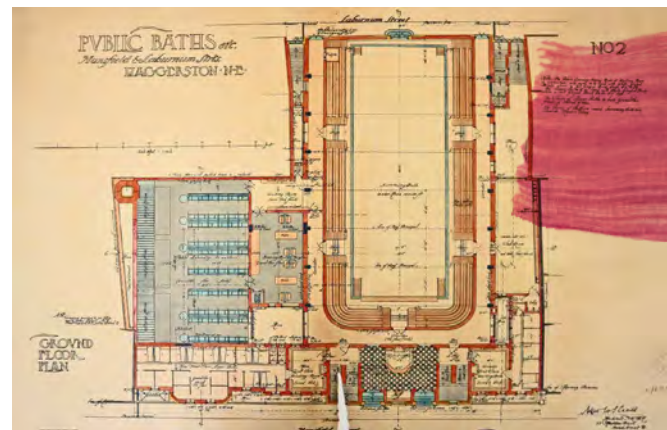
Original ground floor plan. 1904. From : Hackney Archives
